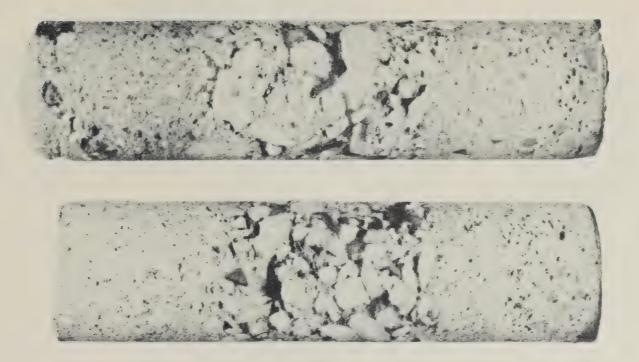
Polymer rebonded concrete cores from New York Department of Transportation bridge repair trial.
